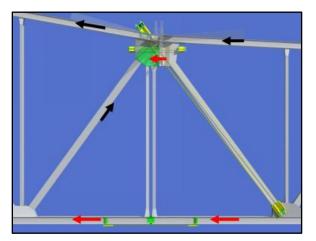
Temporary Load Path B – Splice Plate and Lower Longitudinal Restraint
